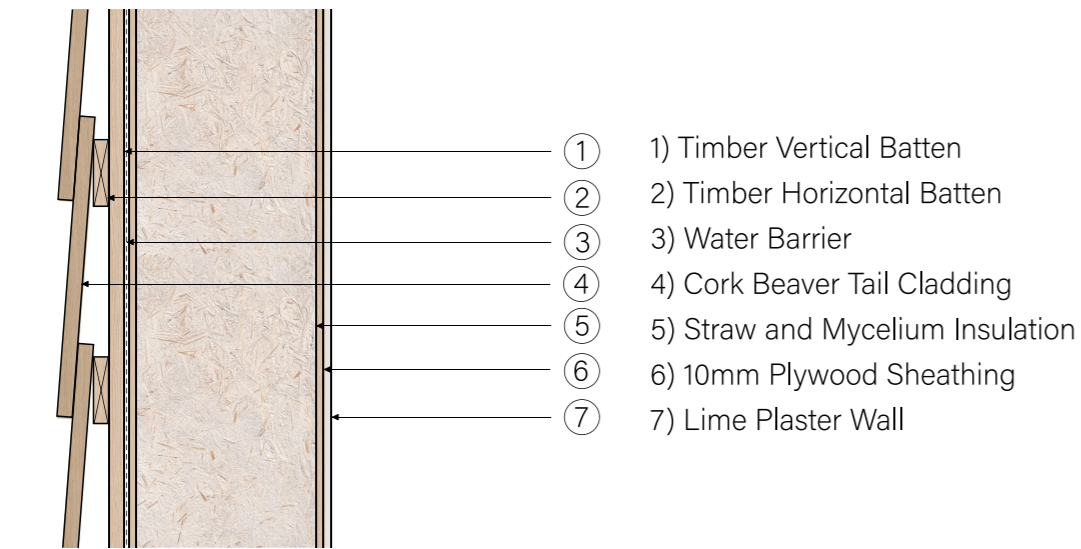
Cork Wall Detail Drawing (Scale 1:200)
